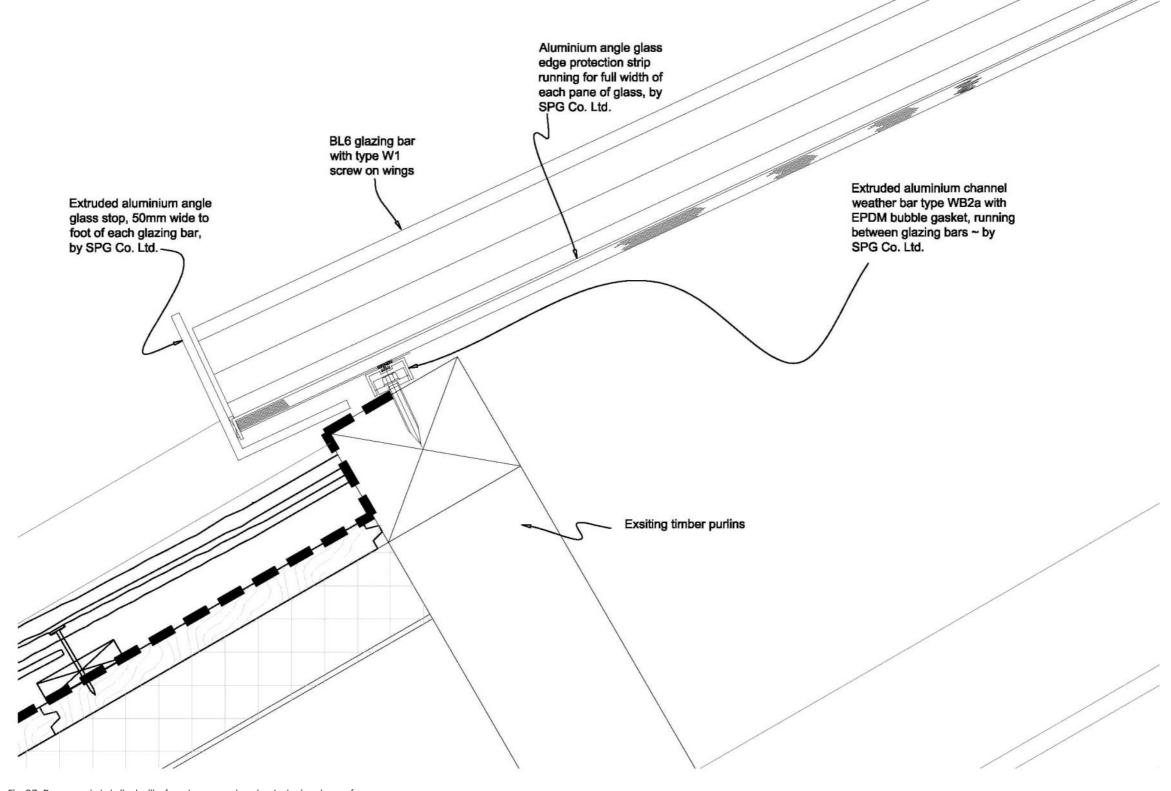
Proposed detail at cill of replacement patent glazing to roofs
